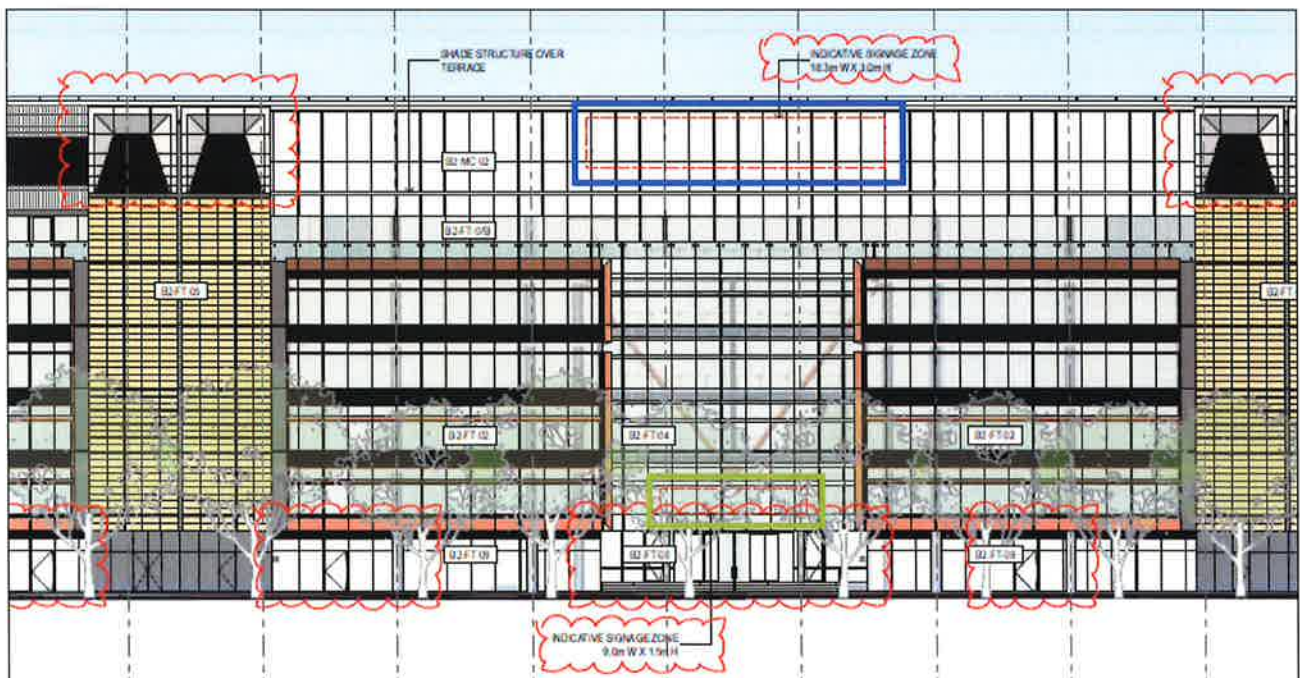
Part of the northern elevation of Building 2, showing the proposed new signage zone (in Green) and the signage zone to be increased (in Blue) (Base source: Applicant's modification request)
